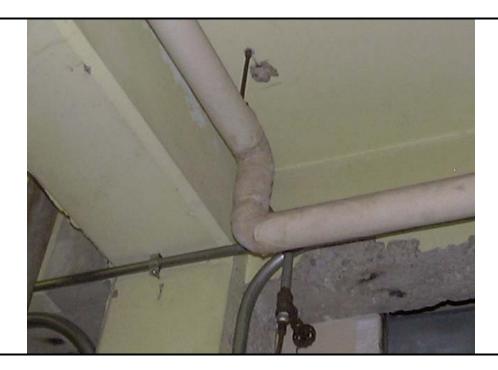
Paper on fiberglass insulation - OMS Building (Non-ACM)
